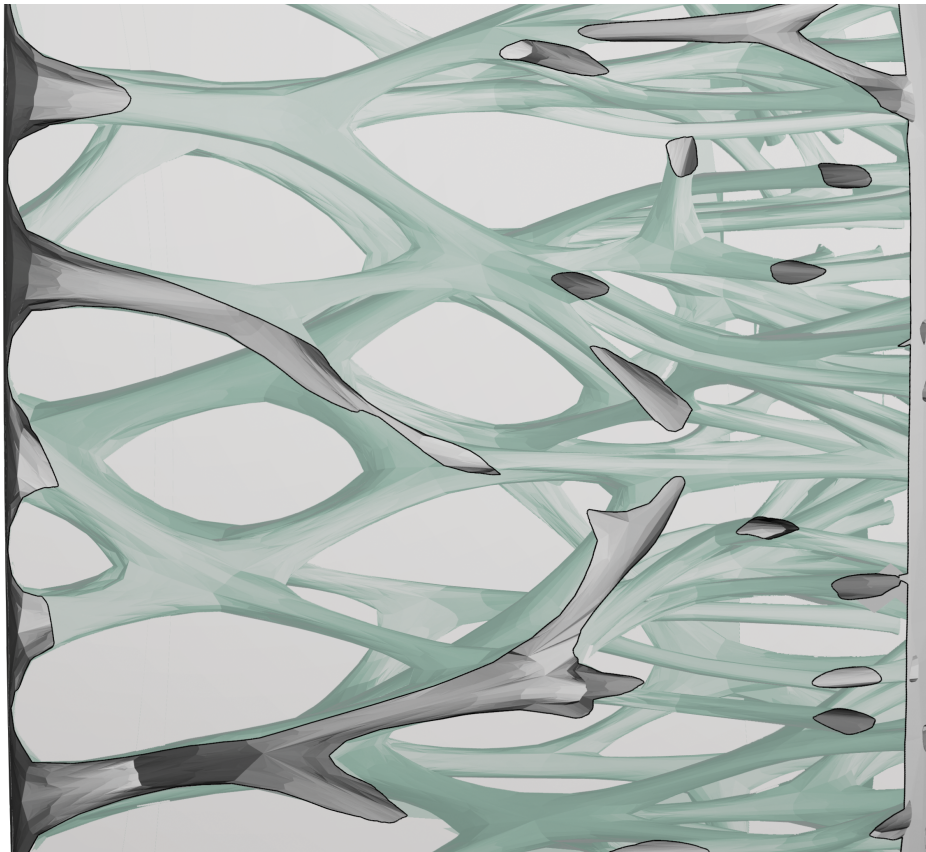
Wall section: internal structure of reticulated channel network (wall thickness 150 mm)
